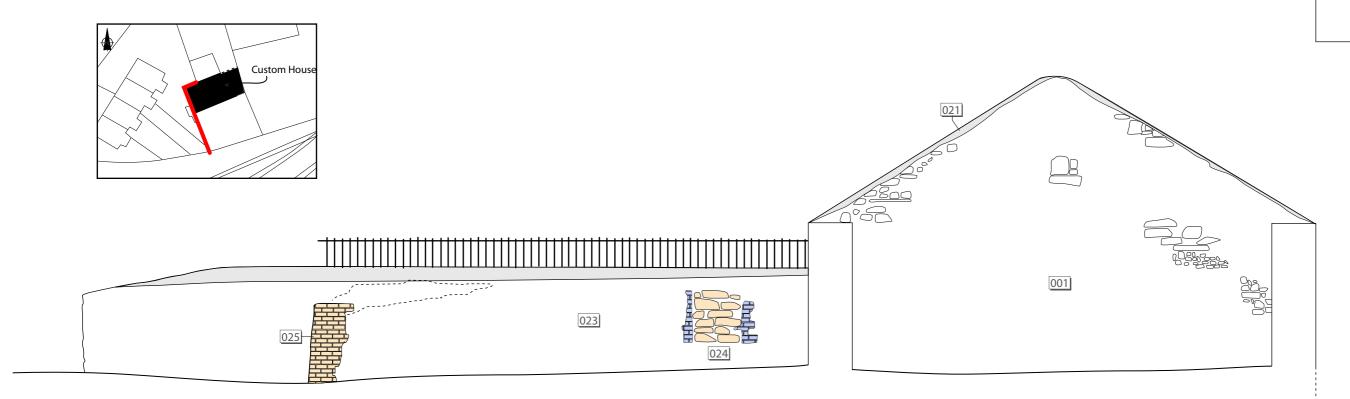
West Elevation, garden wall and internal gable of Custom House
